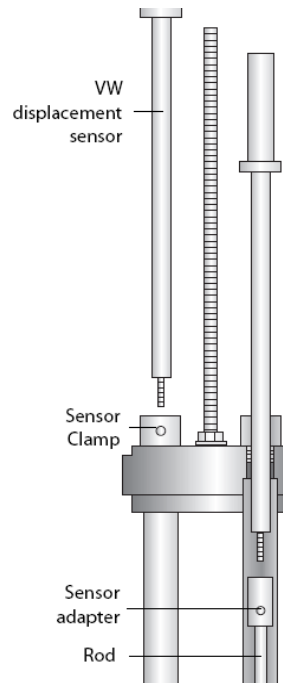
Placement of the Assembled Rods and Reference Head into the Drilled Hole.
